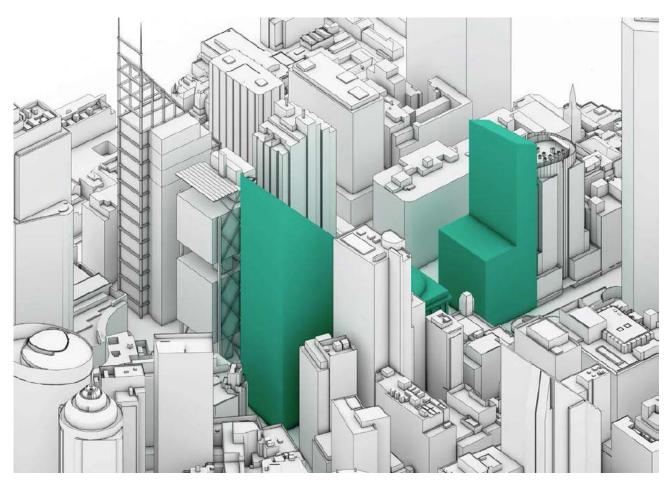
North Site and South Site approved OSD Building Envelopes (SSD 17_8351)
